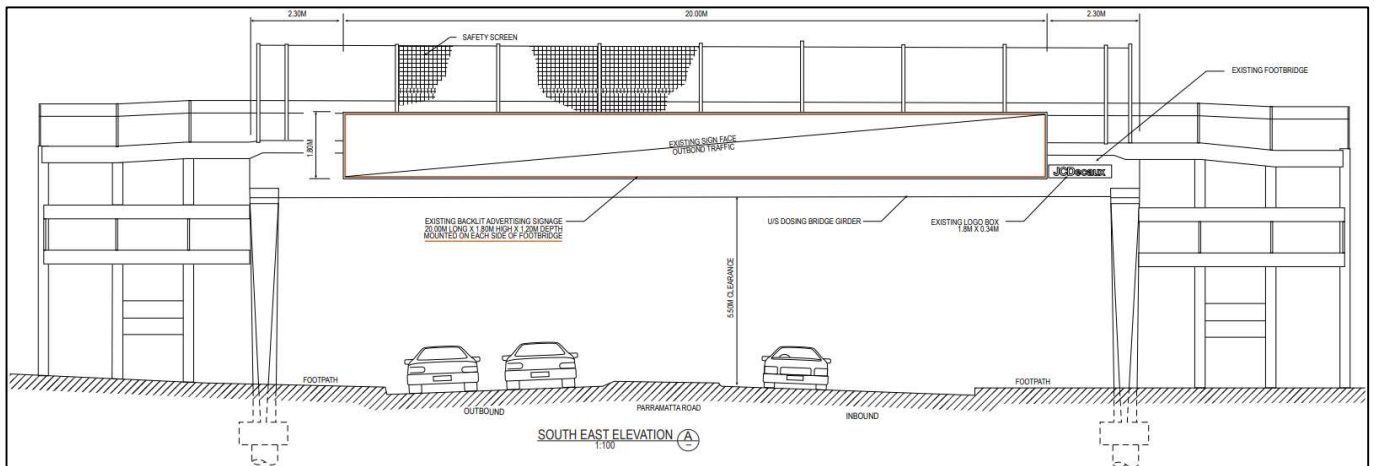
| Sign elevation – east (source: revised architectural drawings 27/5/24)
